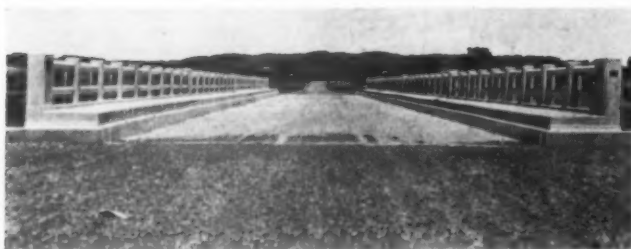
Stepped Curb With Walk at Level of Top Step. Roadway 24 ft. Between Bottom Curbs. Top of Lower Curb, 11½ in. Above Gutter; Walk 1 ft. 8½ in. Above Gutter; Walk 3 ft. Wide; Top of Rail 3 ft. 0 in. Above Walk. Unfavorable Feature Is Height of Rail Above Gutter From Motorist's Standpoint and Necessity of Pedestrian to Step Up Two Steps to Get Onto Walk. Better Arrangement for Walk Is Shown in Fig. 5. Appearance Might Be Improved if Sloping End Posts Were Introduced on Abutments, Providing a Gradual Reduction in Height at Ends of Bridge.
